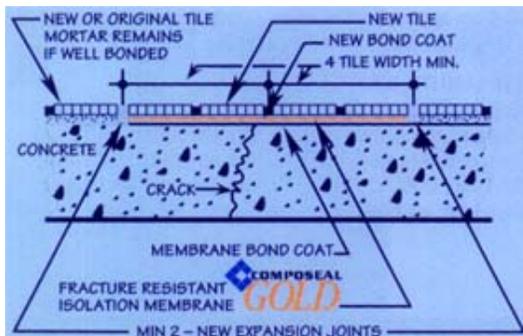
Crack repair with tile work; fracture resistant isolation membrane (refer to Technical Report #92-1)
